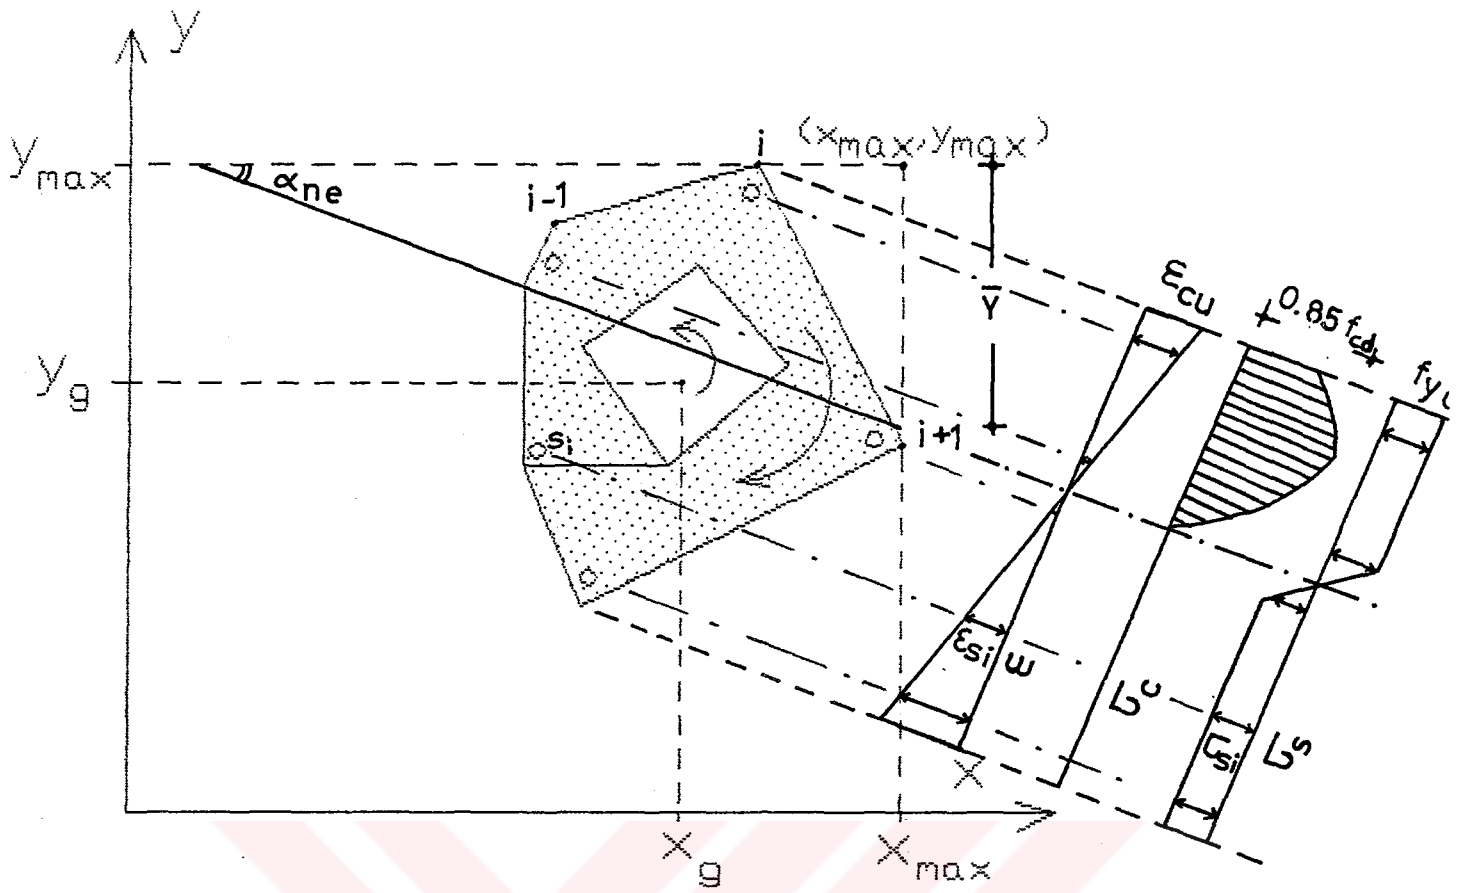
Cracked Polygonal Reinforced Concrete Cross-Section.
